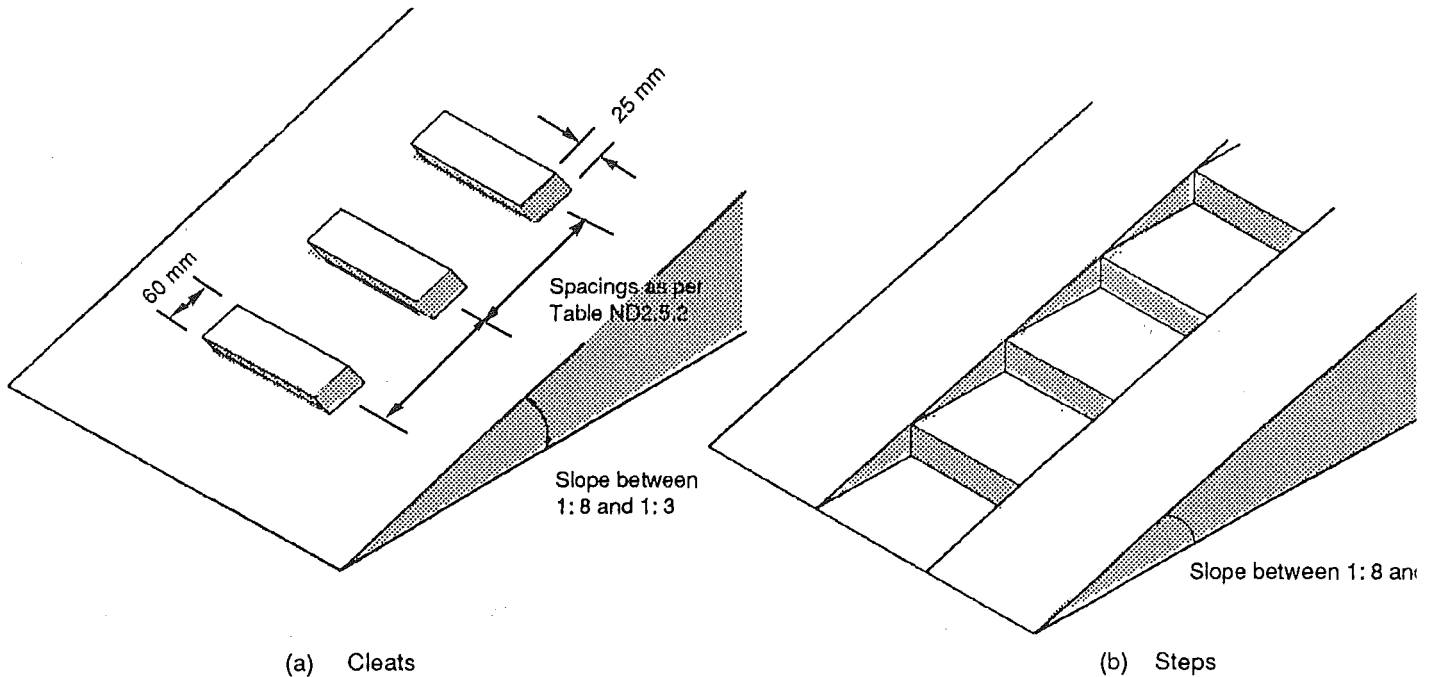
EXAMPLES OF SERVICE RAMPS WITH CLEATS
